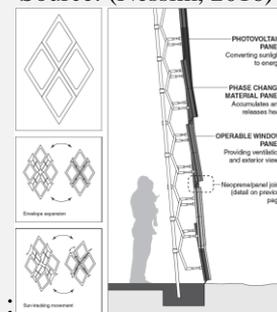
S.C.A.L.E.S. building envelope & adaptation mechanism
